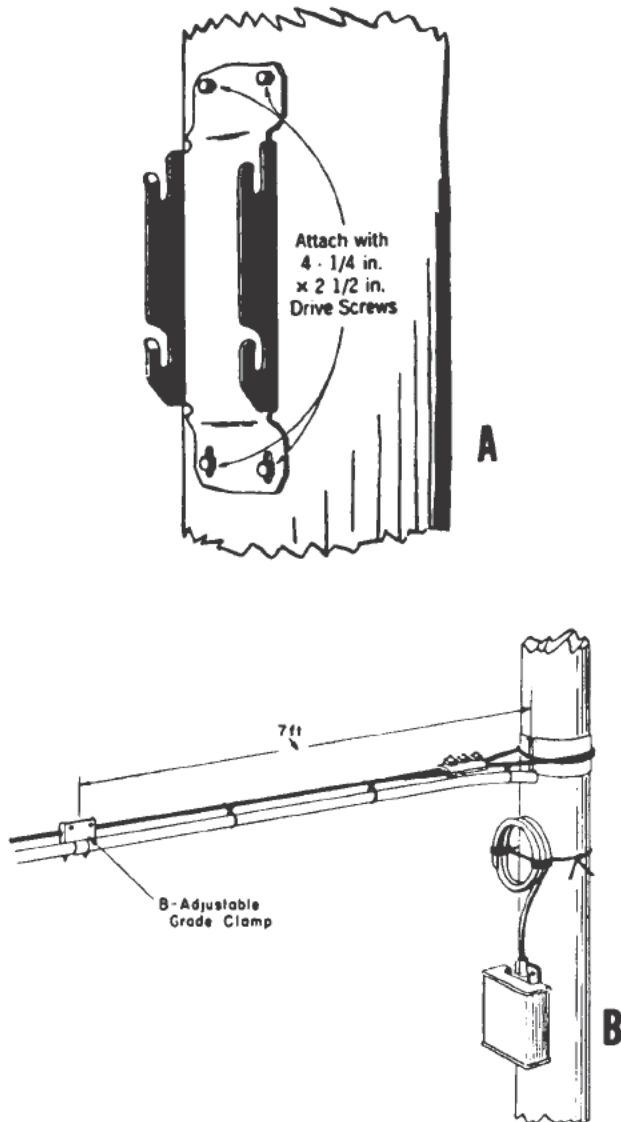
Pole-mounted terminal box: A, mounting plate; B, box installed.
